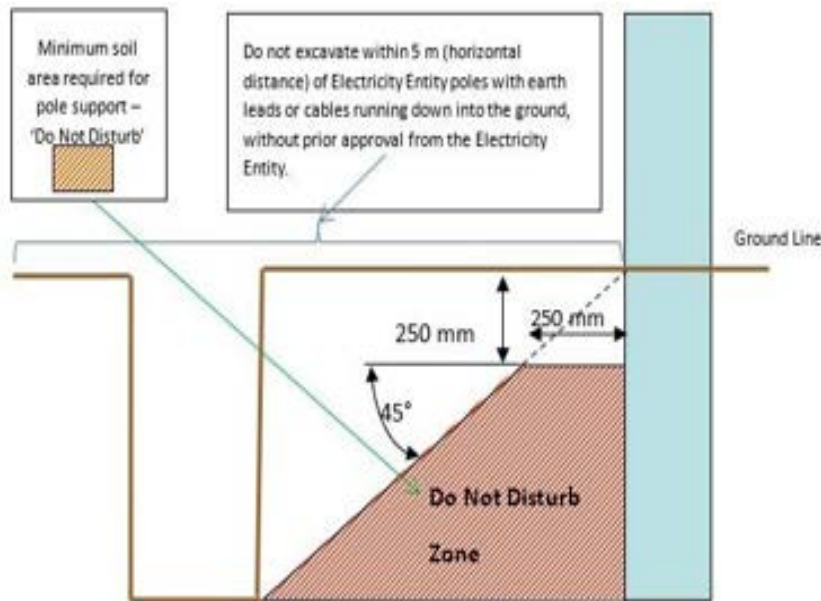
Do Not Disturb Zone requirements when excavating near poles
